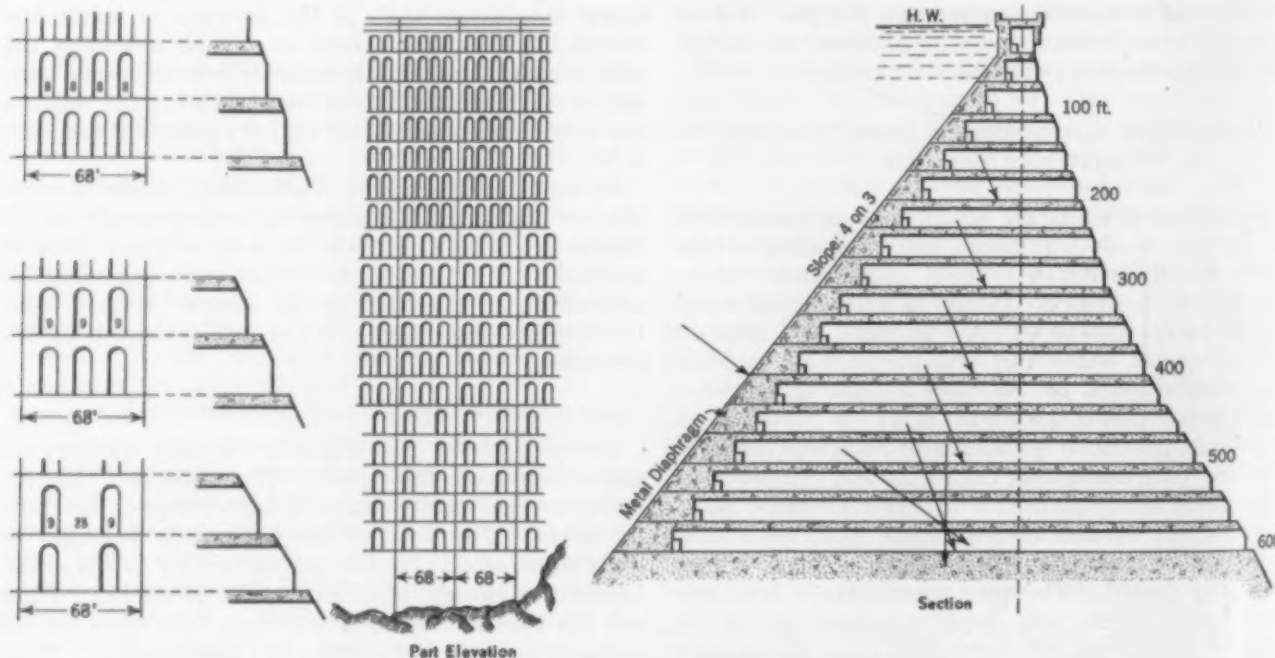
CONCRETE DAM—HONEYCOMB GRAVITY TYPE
